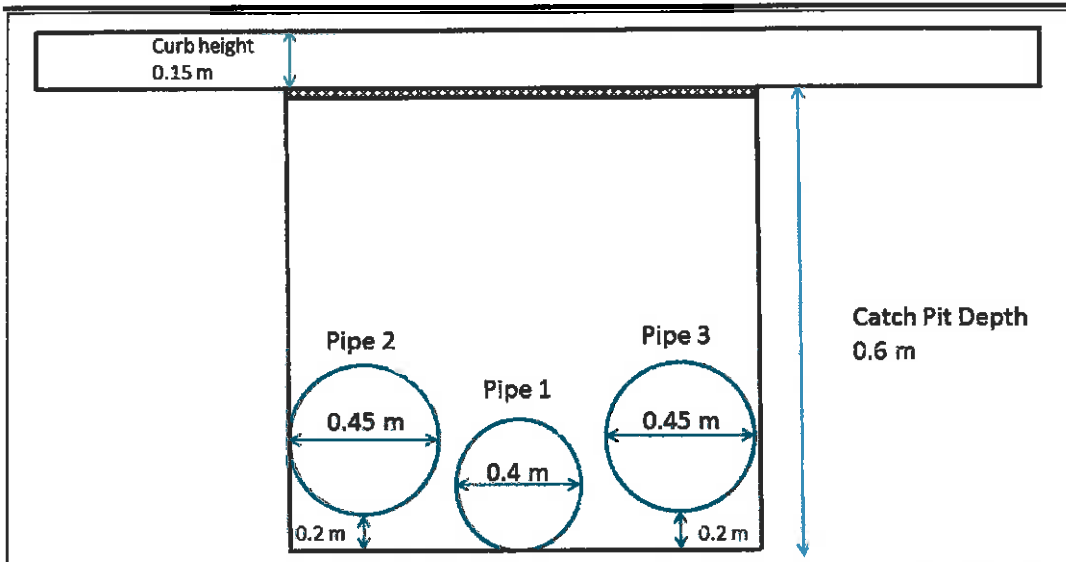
Conceptual Cross Section Schematic of the Catch Pit and the Stormwater diversion Pipes.
